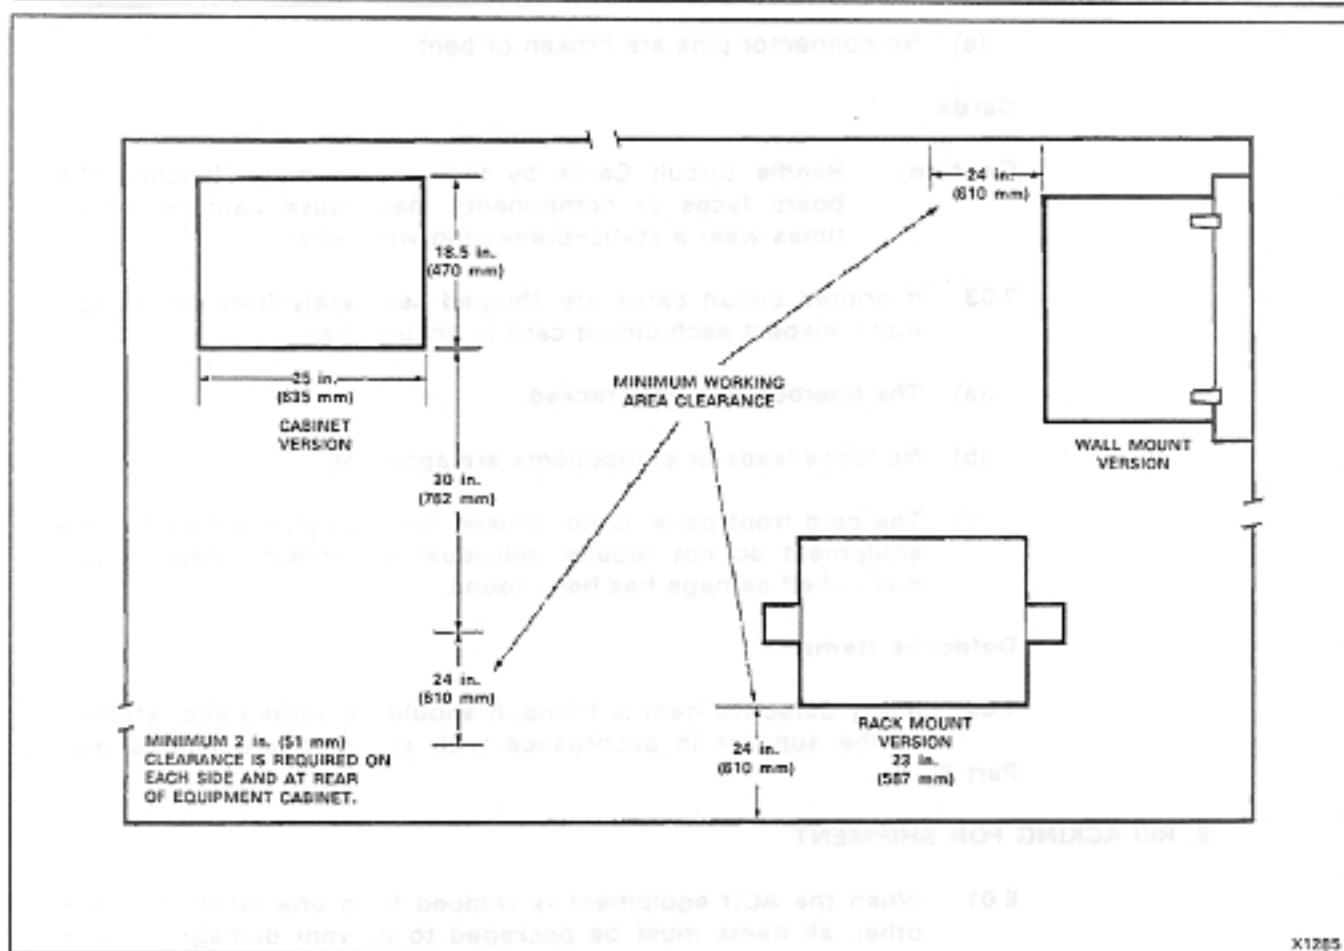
SX-100 Minimum Equipment Cabinet Floor Space Requirements
